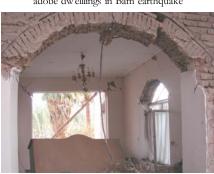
Barn earthquake: Damage to a traditional adobe house. Nonbearing walls collapsed, bearing walls are still standing.
